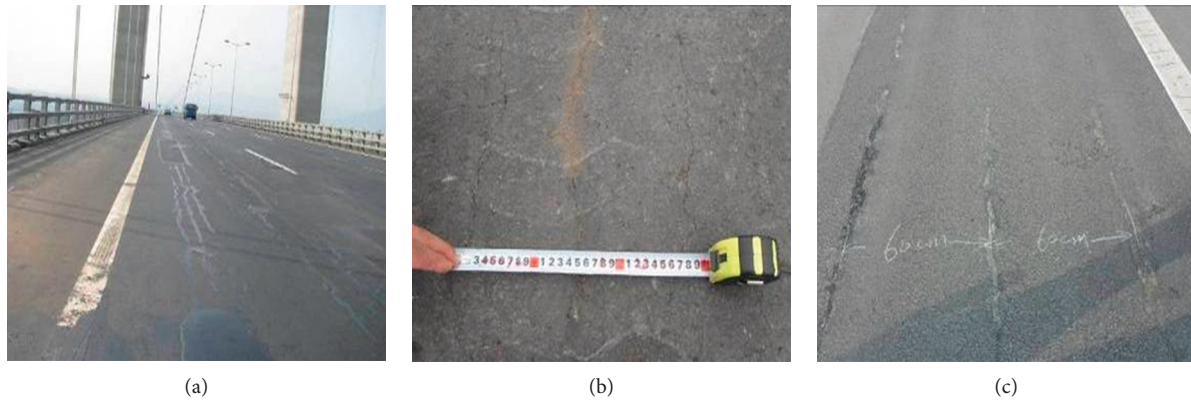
Fatigue cracks in epoxy asphalt on steel bridge deck pavement.
